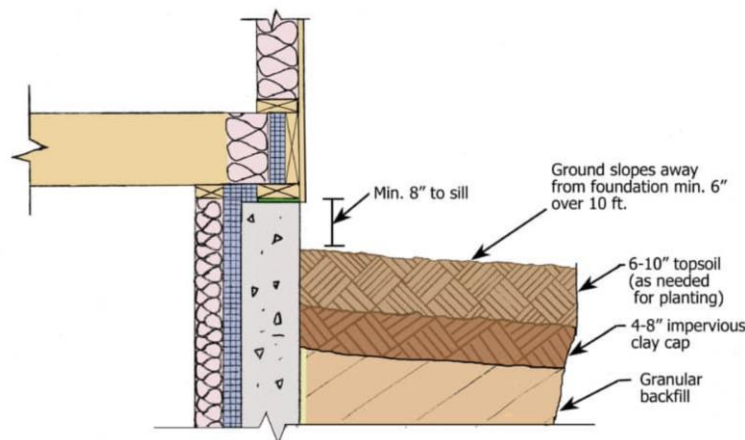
Illustration of lot grading around foundation (buildingadvisor.com).
